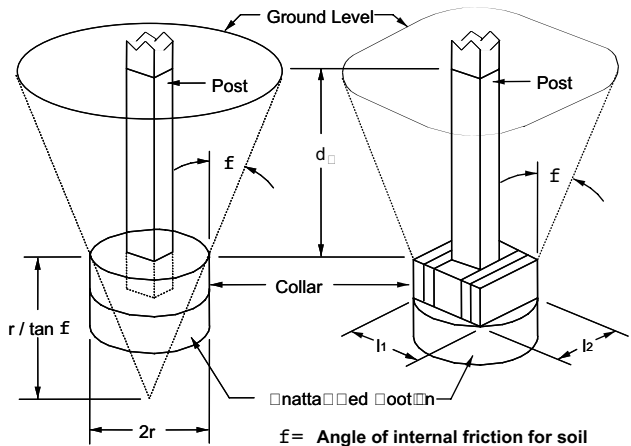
Conical-shaped failure planes that must form before post foundation can be withdrawn.
